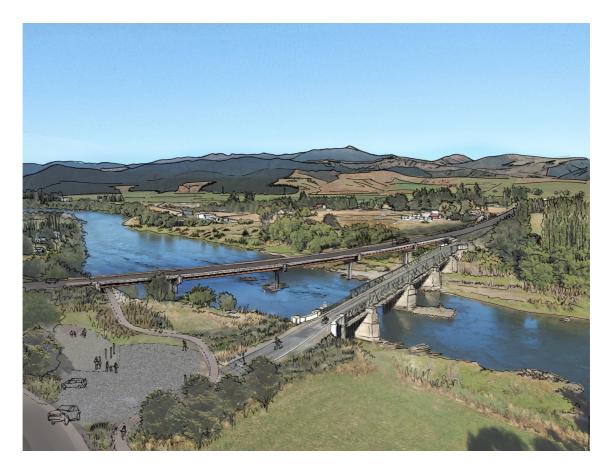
Artists impression of the new State Highway 8 bridge over the Clutha River at Beaumont, looking downstream showing the existing bridge in the foreground.
